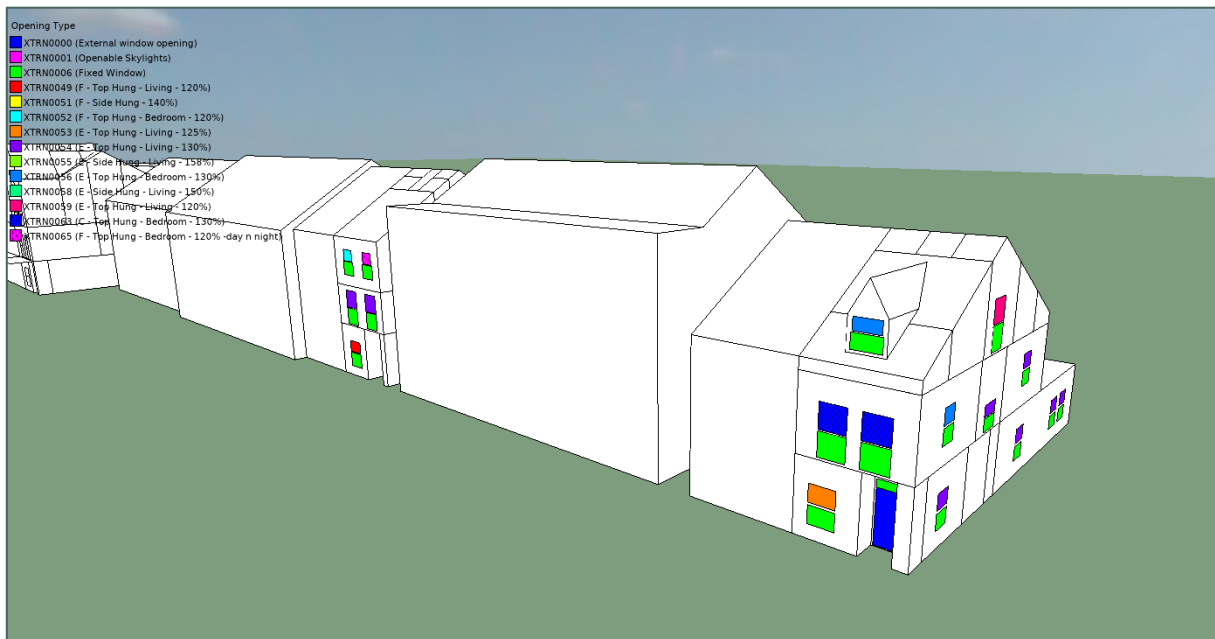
Opening Types applied within the blocks T3 and Type E (view from Southwest Elevation)
